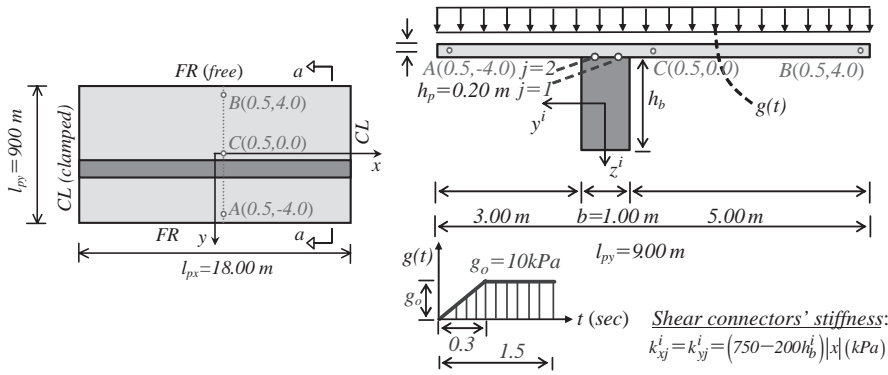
Plan view, section a-a and loading of the stiffened plate of Example 1.
